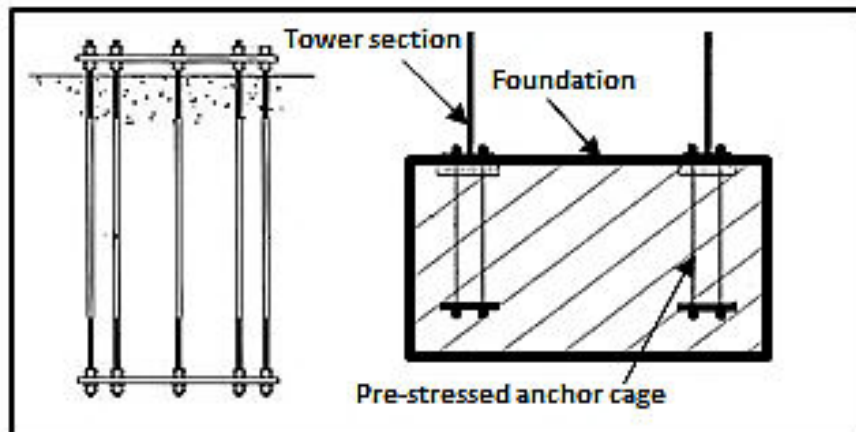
Gravity foundation with Pre-stressed anchor bolt cage
